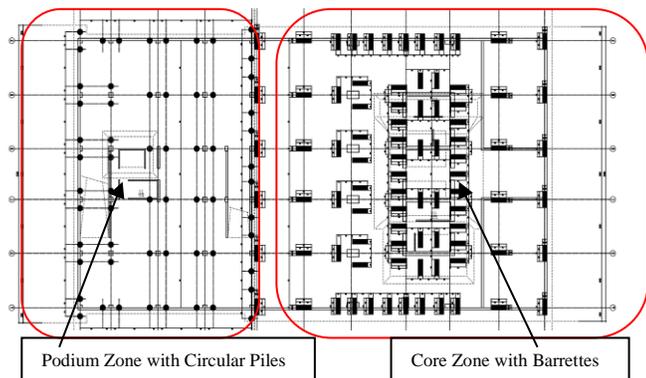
Plan of Barrette/Circular Piles under the each Tower (Kocak, et al., 2012)
